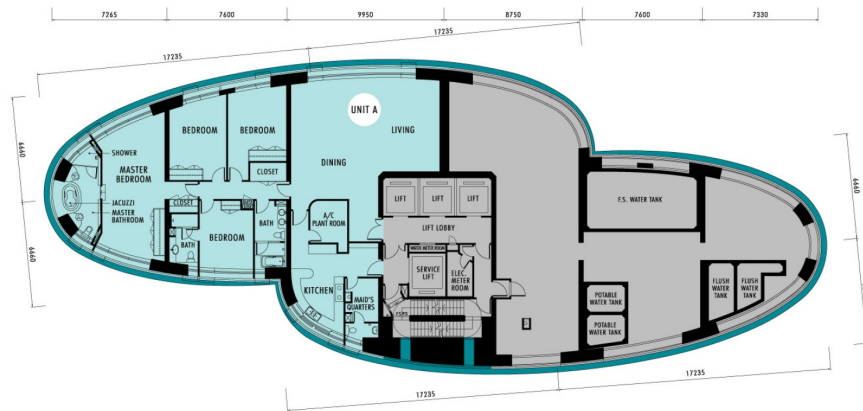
Example floor plan of Highcliff residential tower (dimensions in mm)(image taken from www.highcliff.com.hk)
